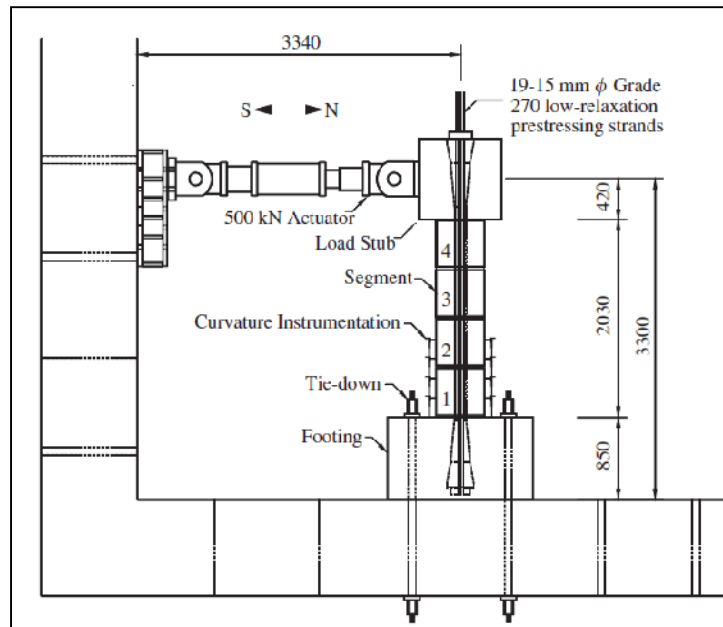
Elevation view of test setup with all the equipments labeled [20].
